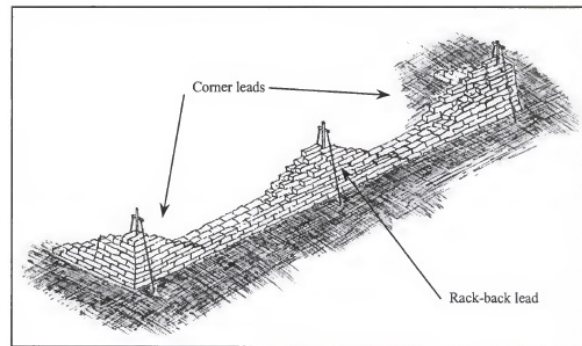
The corner and back of the adobe wall, Source: (Via di , S. Michele, 1983)
